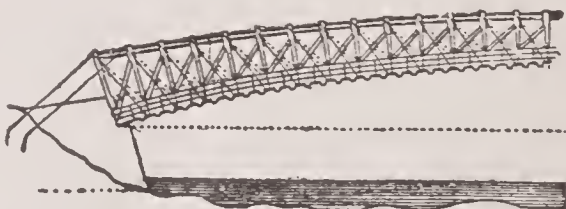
HALF-SECTION OF ARCH TRUSS BRIDGE OVER THE SCHUYLKILL AT PHILADELPHIA.
